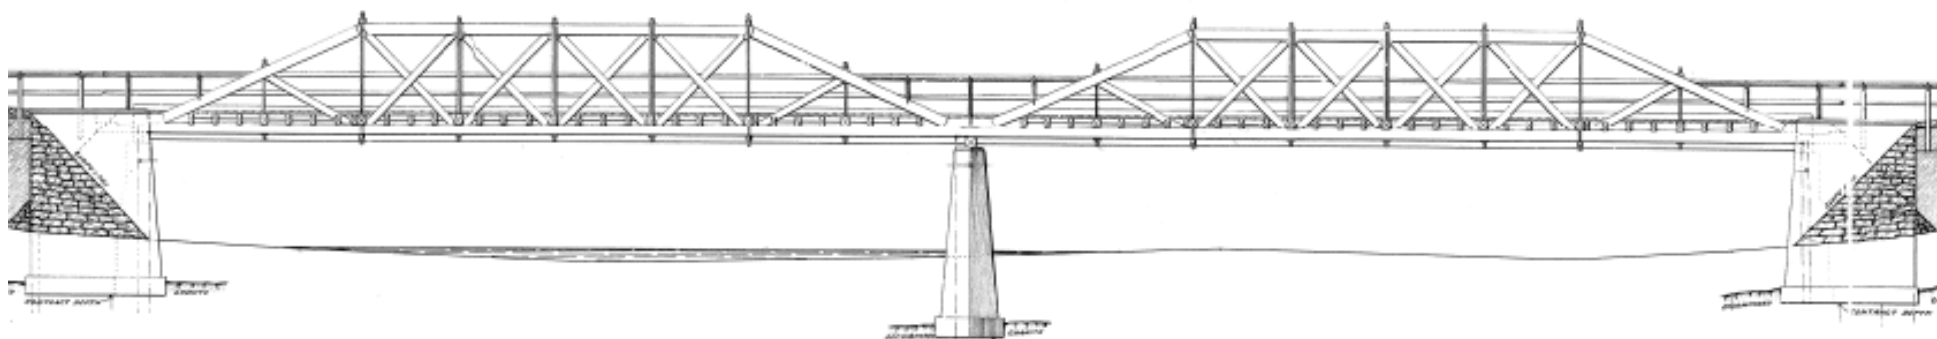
McKanes Bridge (Source: Roads and Maritime)
